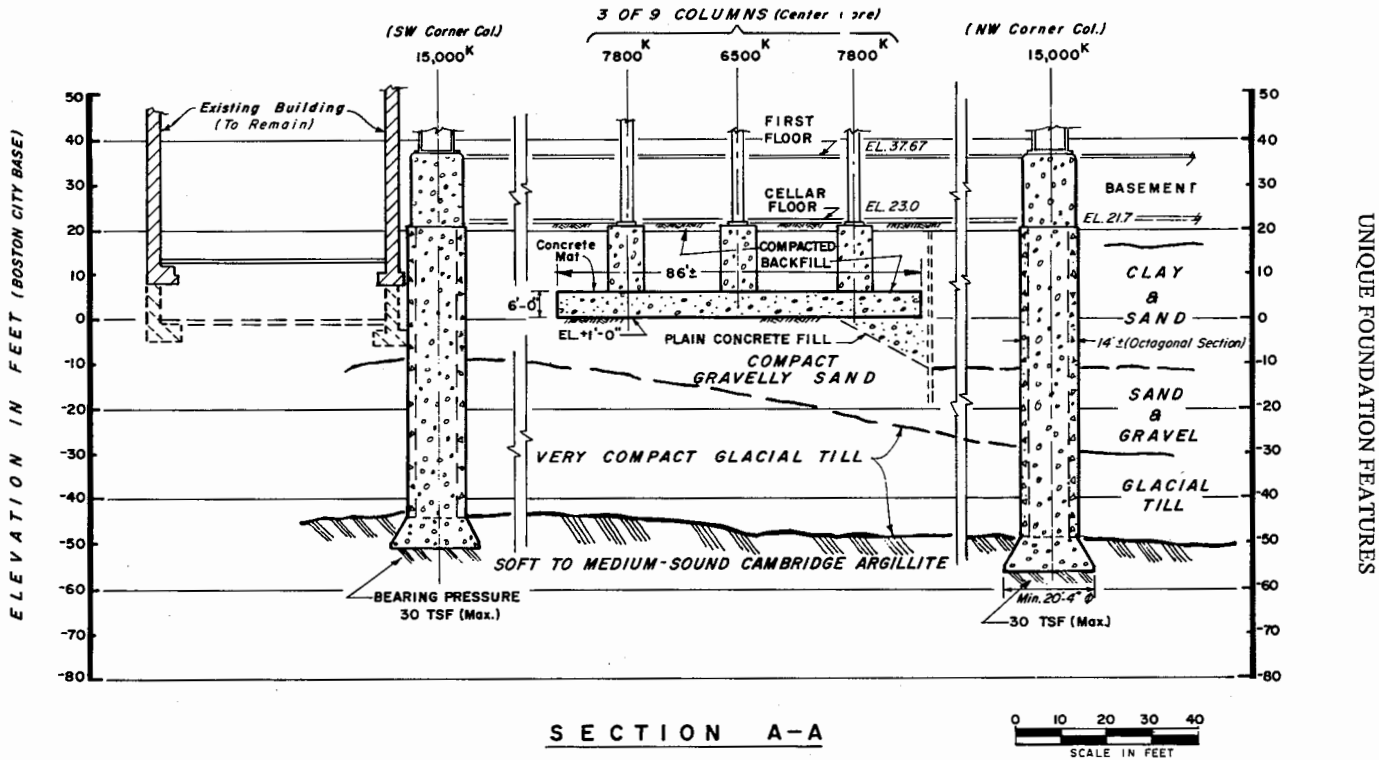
Foundation Section; Typical Geometry And Column Design Loads
